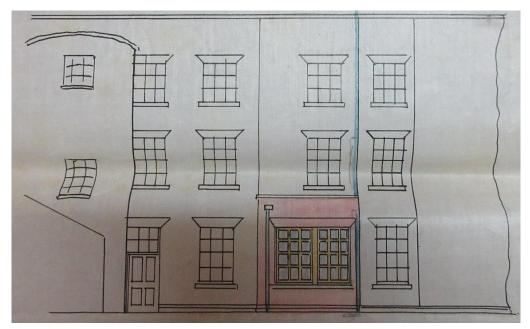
Elevation – Proposed single-storey extension to the side of the building, where a study was located, 1920.
